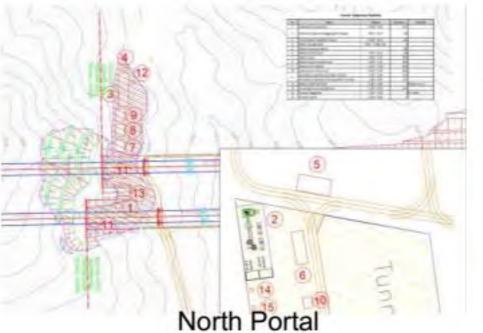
Tunnel Construction Yard (Temporary Facilities)
